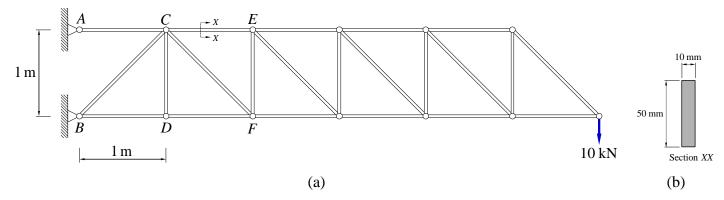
(a) A long pin-jointed truss and (b) cross-section of all its members.
